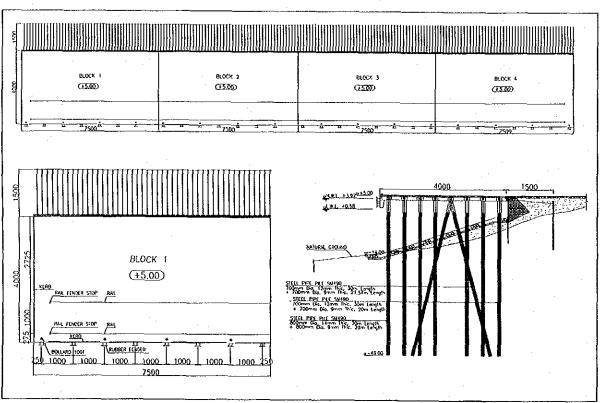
Plan and Elevation of 50,000DWT GC Quay
